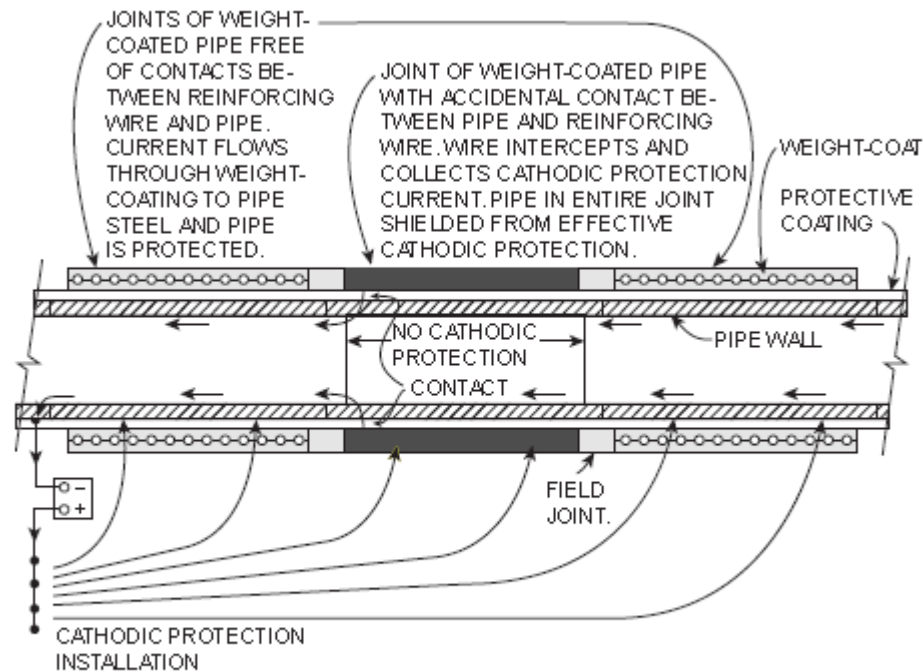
Electrical shielding by shorted reinforcing wire in weight coating.
